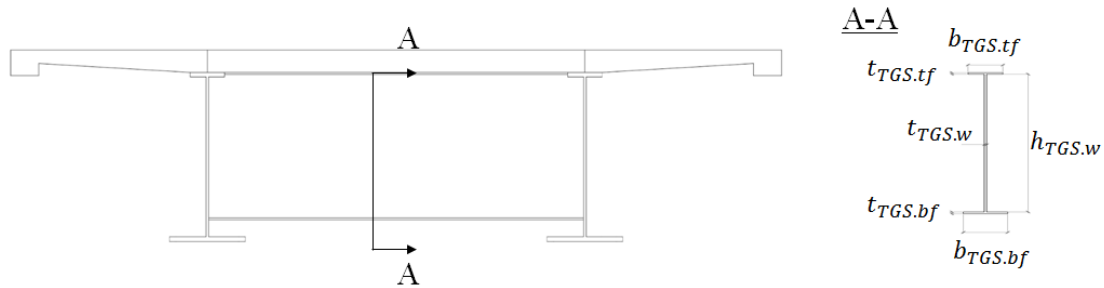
Dimensions of the transverse support girders in the existing composite bridge.
